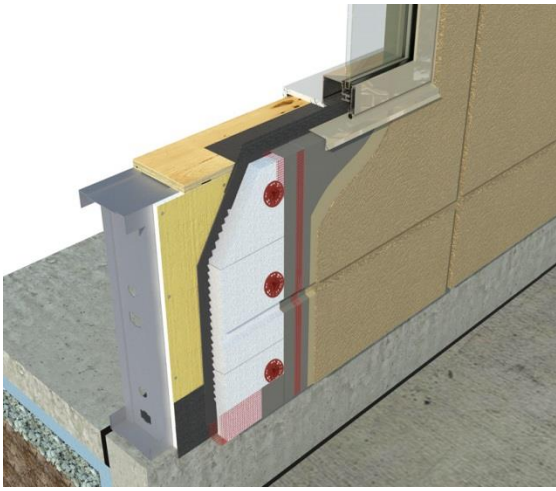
“Adex-MFS” system over a modified bituminous membrane on glass-fibre-faced gypsum
